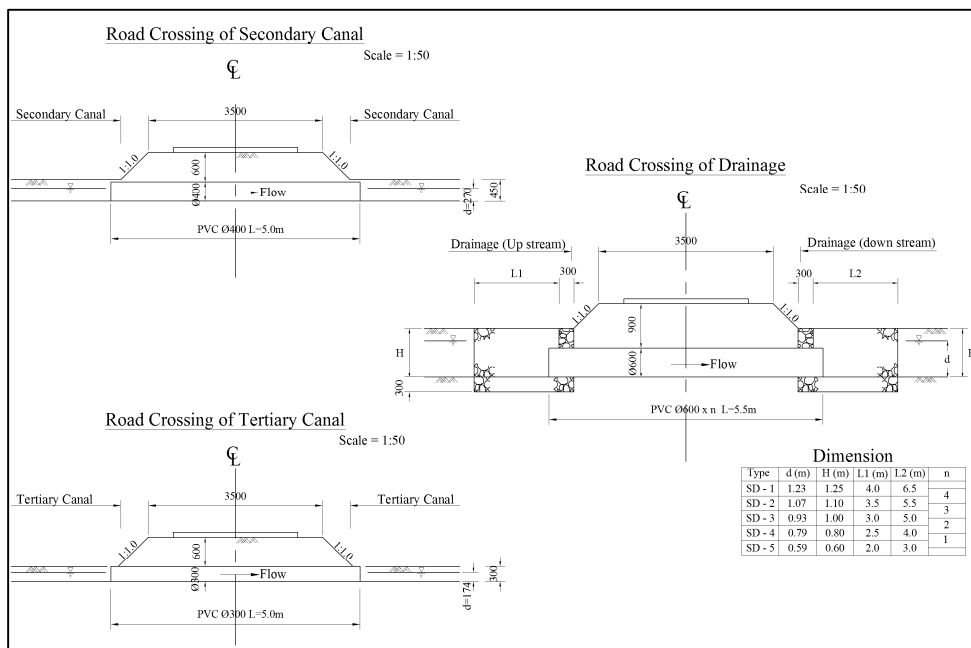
Typical Cross Section of Road Crossing in Command Area
